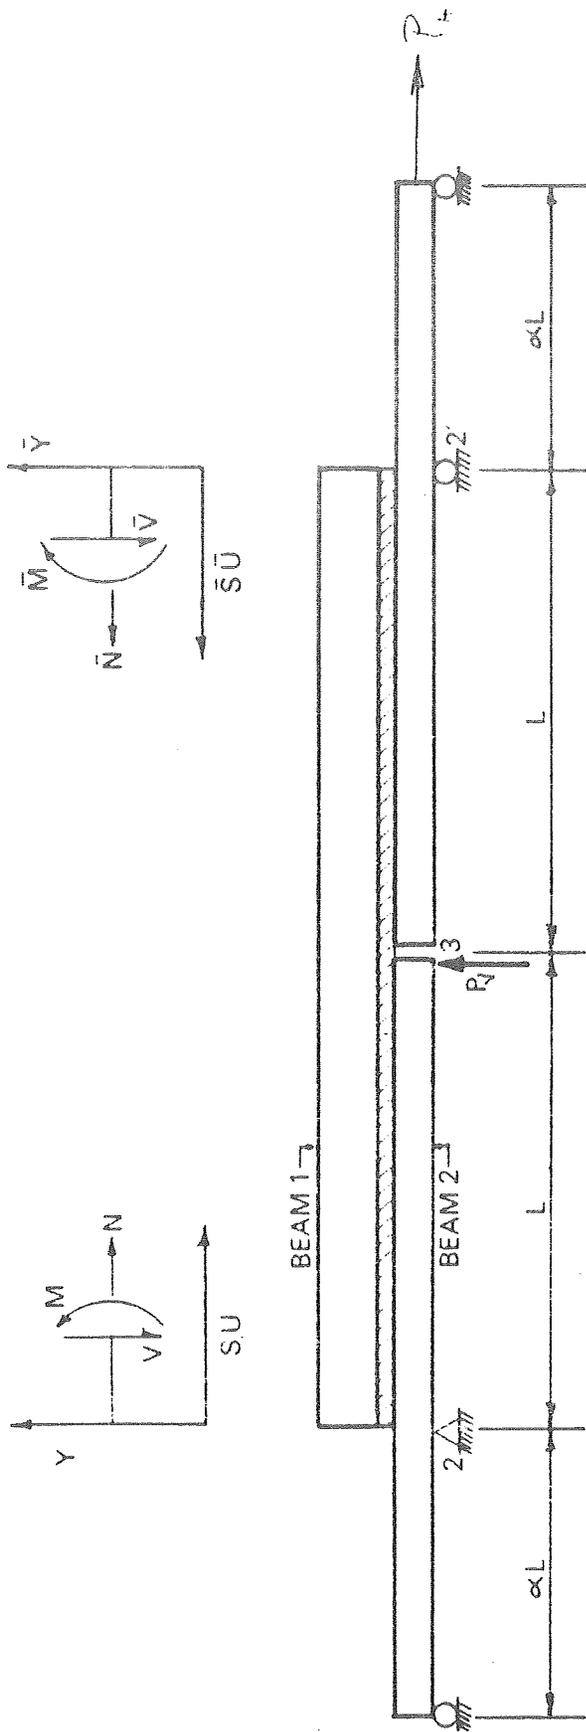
Beam Set-up for Testing Under Repeated Vertical Load or Repeated Horizontal Load.
